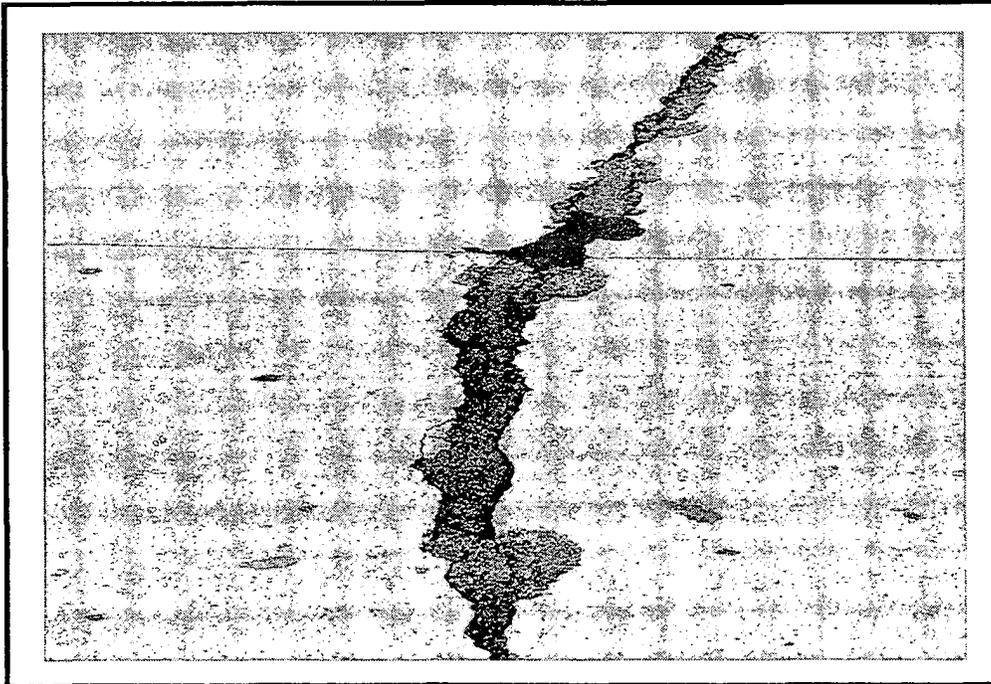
Spalling in CRC Pavement, High Severity
